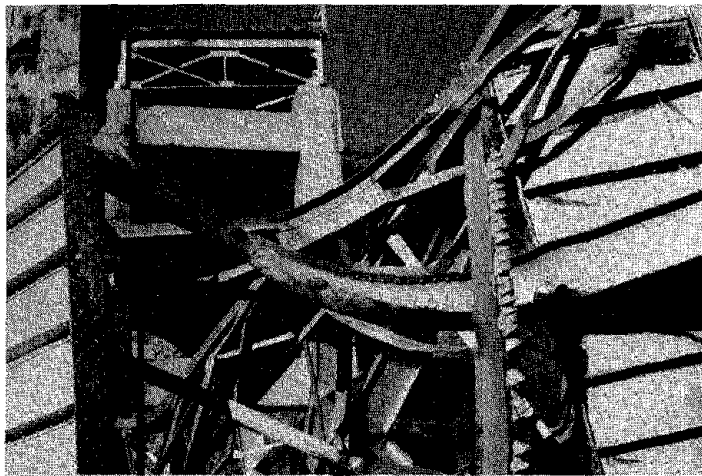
Agua Caliente - Detail of Collapsed Span at Base of Pier 3
